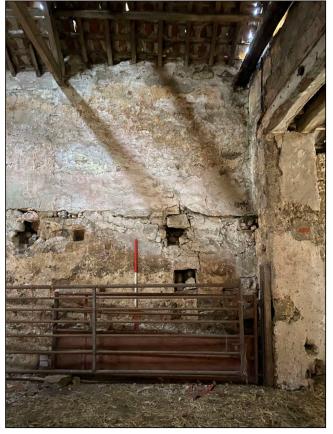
View looking north towards the north-east corner of the former medieval chapel.
